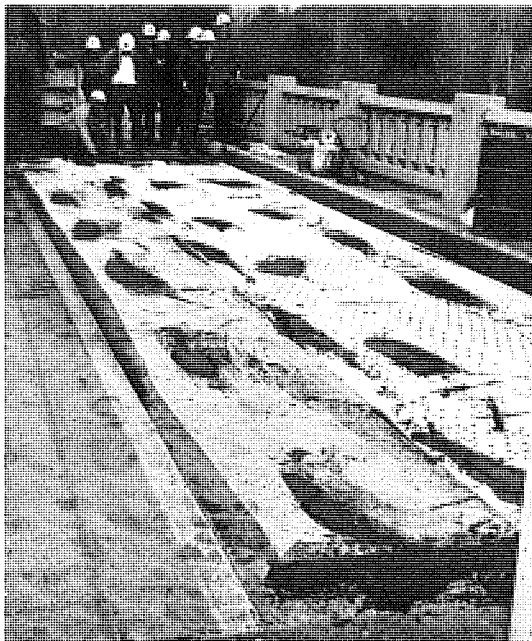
Installation of fiberglass on bridge deck. Note fiberglass mesh lying directly on deck and covered by fiberglass cloth. Patches of asphalt were used to cement mats to deck.
